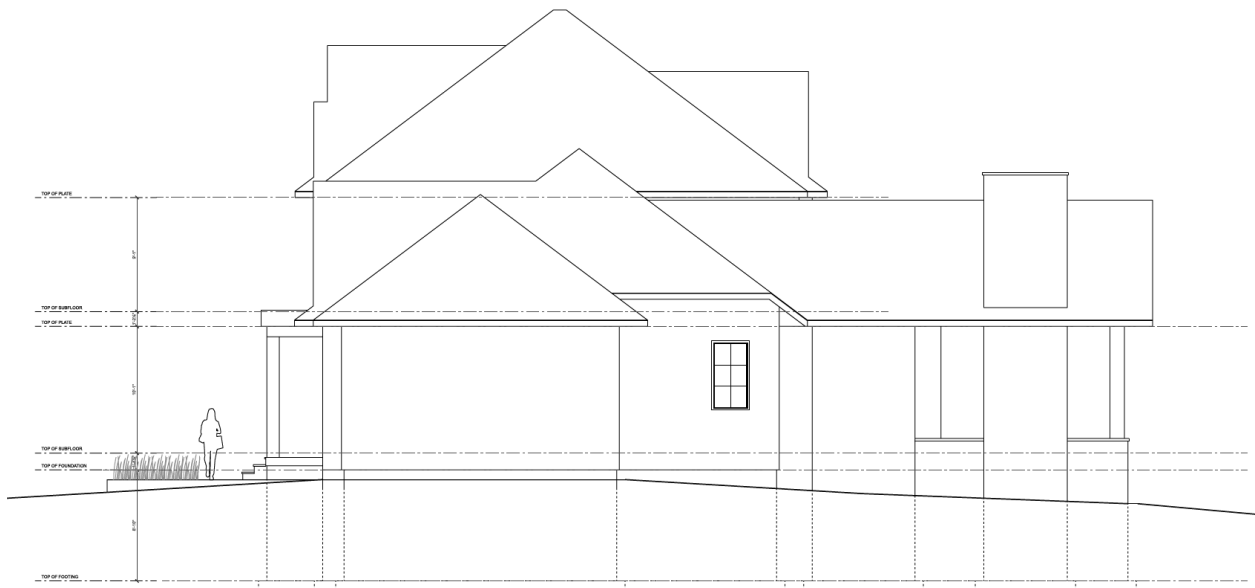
2D Rear Right Elevation of Proposed Building (Source: Ardington & Associates)
